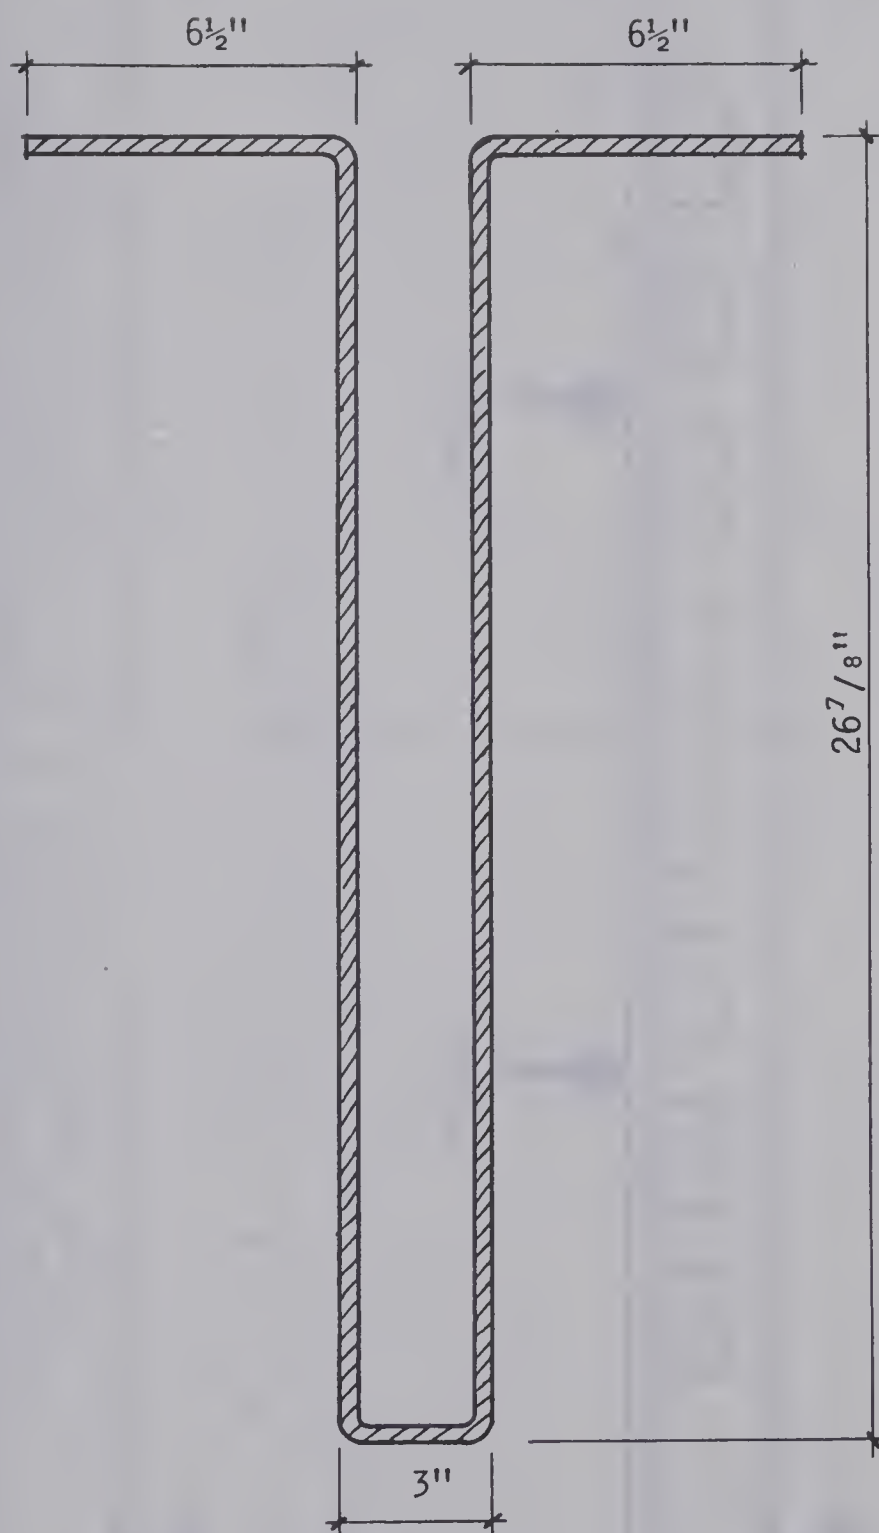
TYPICAL CONCRETE X-SECTION AT AN OPENING
